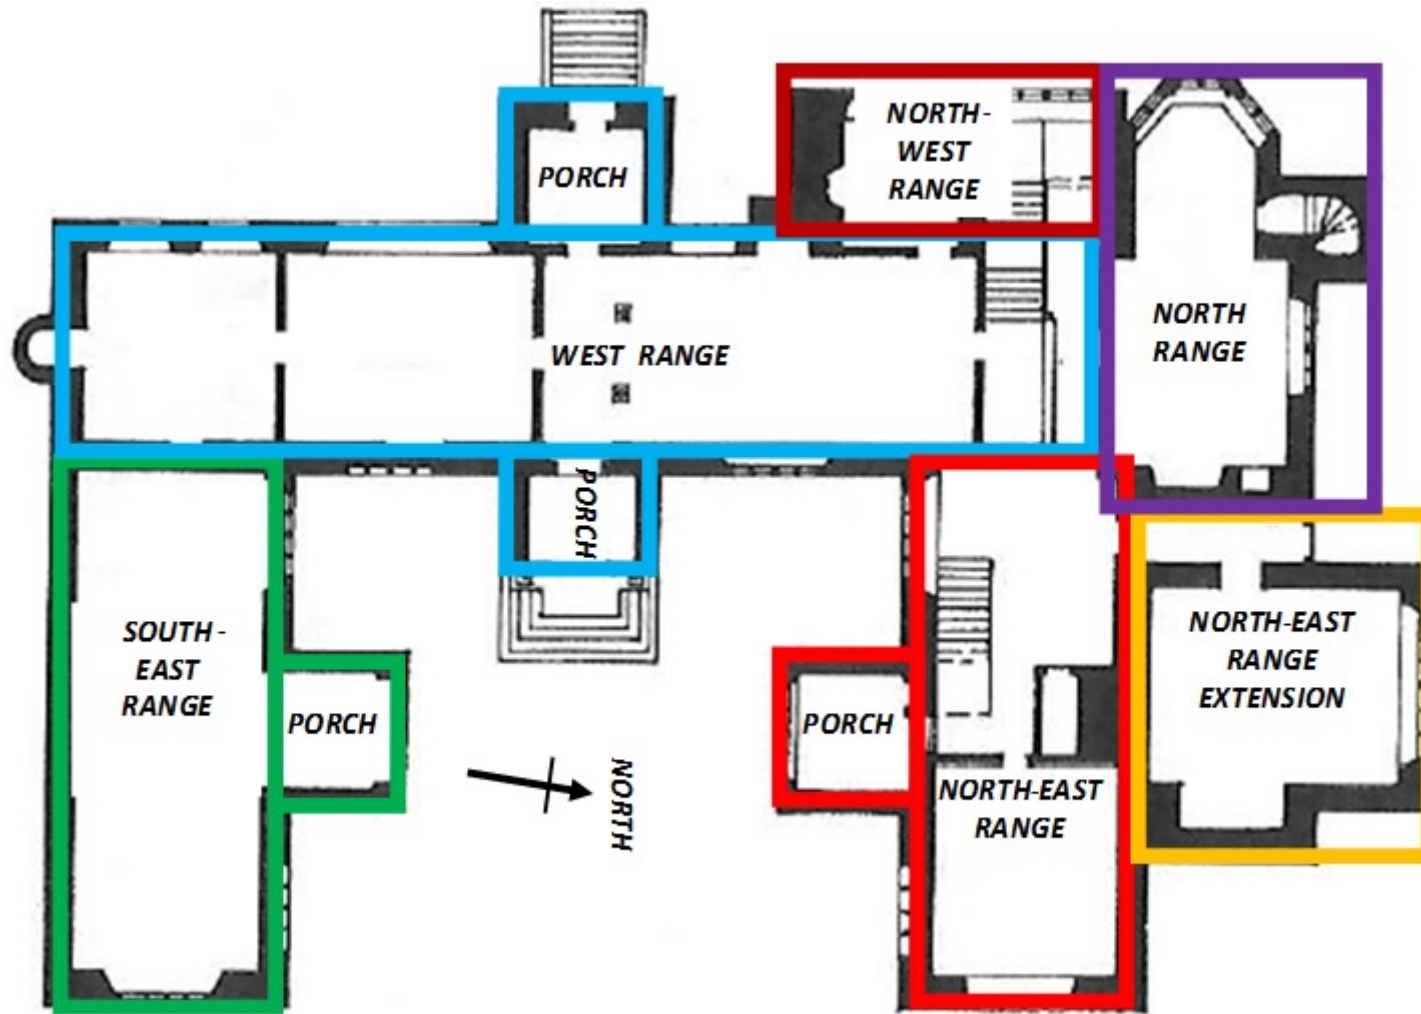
Ground-floor plan, showing the layout and arrangement of the areas investigated (after Cherry and Pevsner 1991)
